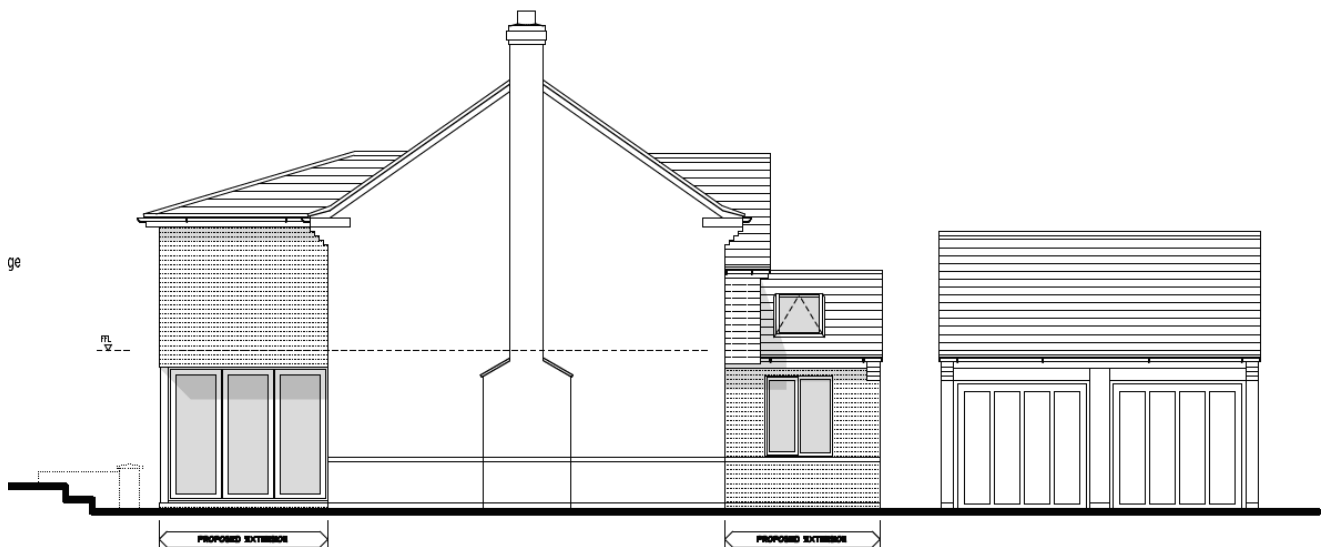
Rear Elevation (South) facing 2 Burghley Close
